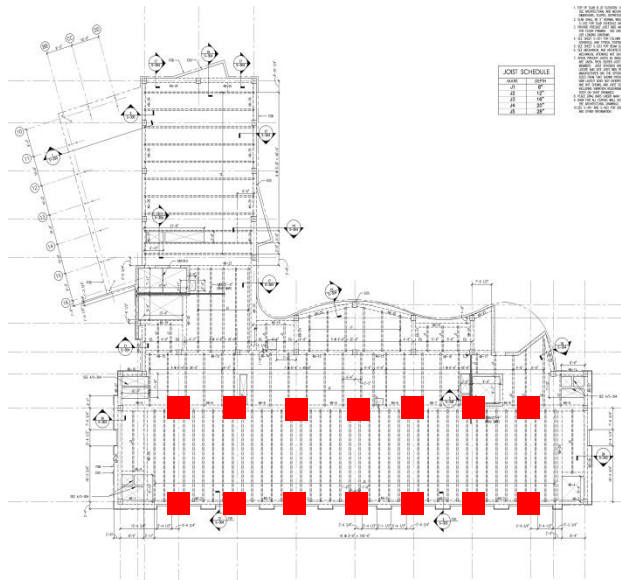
Floor plan showing the 6,000 psi column in basement and 1 floor
